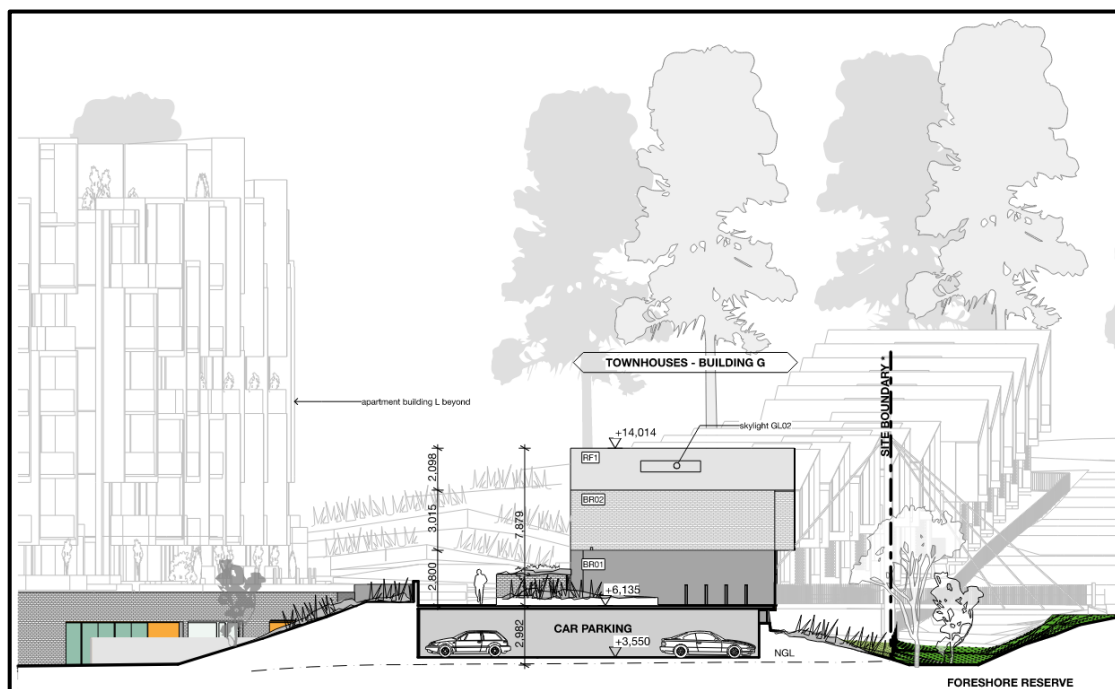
An elevation view of townhouses looking toward the east from Cadbury Road, showing the townhouses ascending along the southern boundary of the site and the midrise apartments of building L in the view field to the left of the figure.
